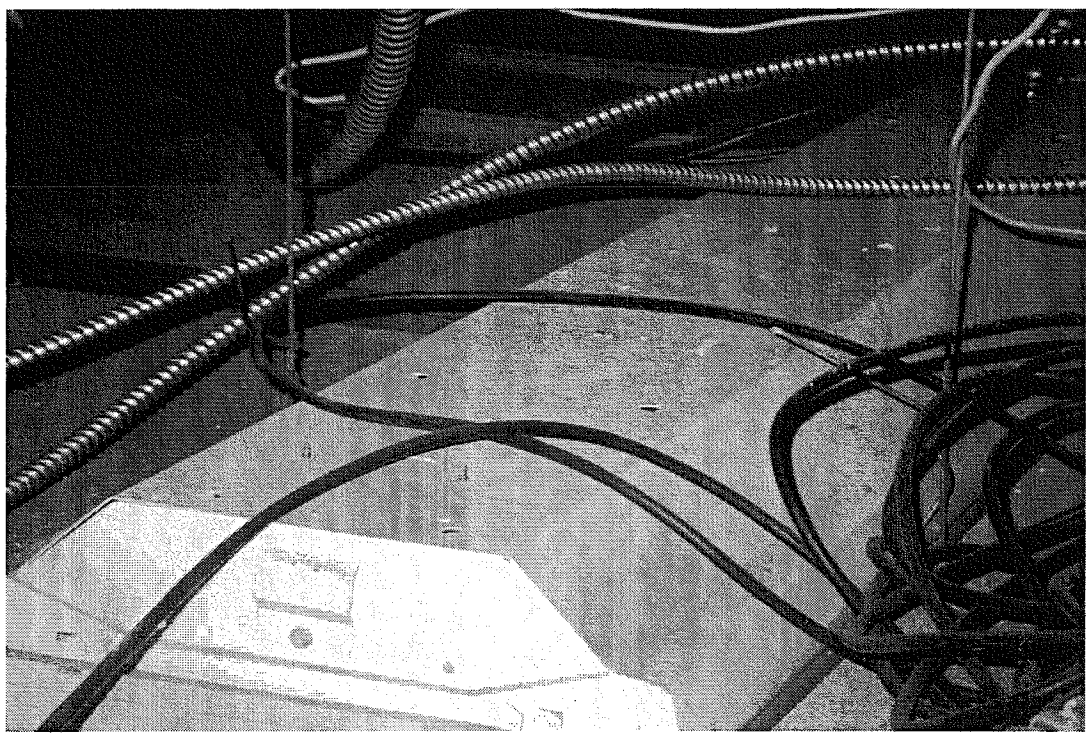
Delaminated fireproofing dust and debris on top of fluorescent light above suspended ceiling 10th floor, W side - hallway outside Rm 1024
